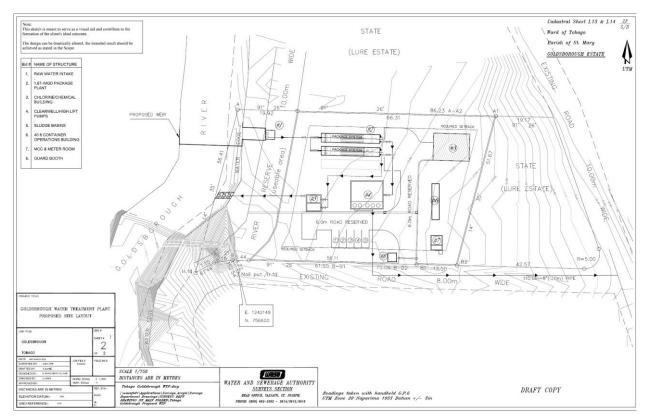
Conceptual Site Layout for the Goldsborough New WTP
